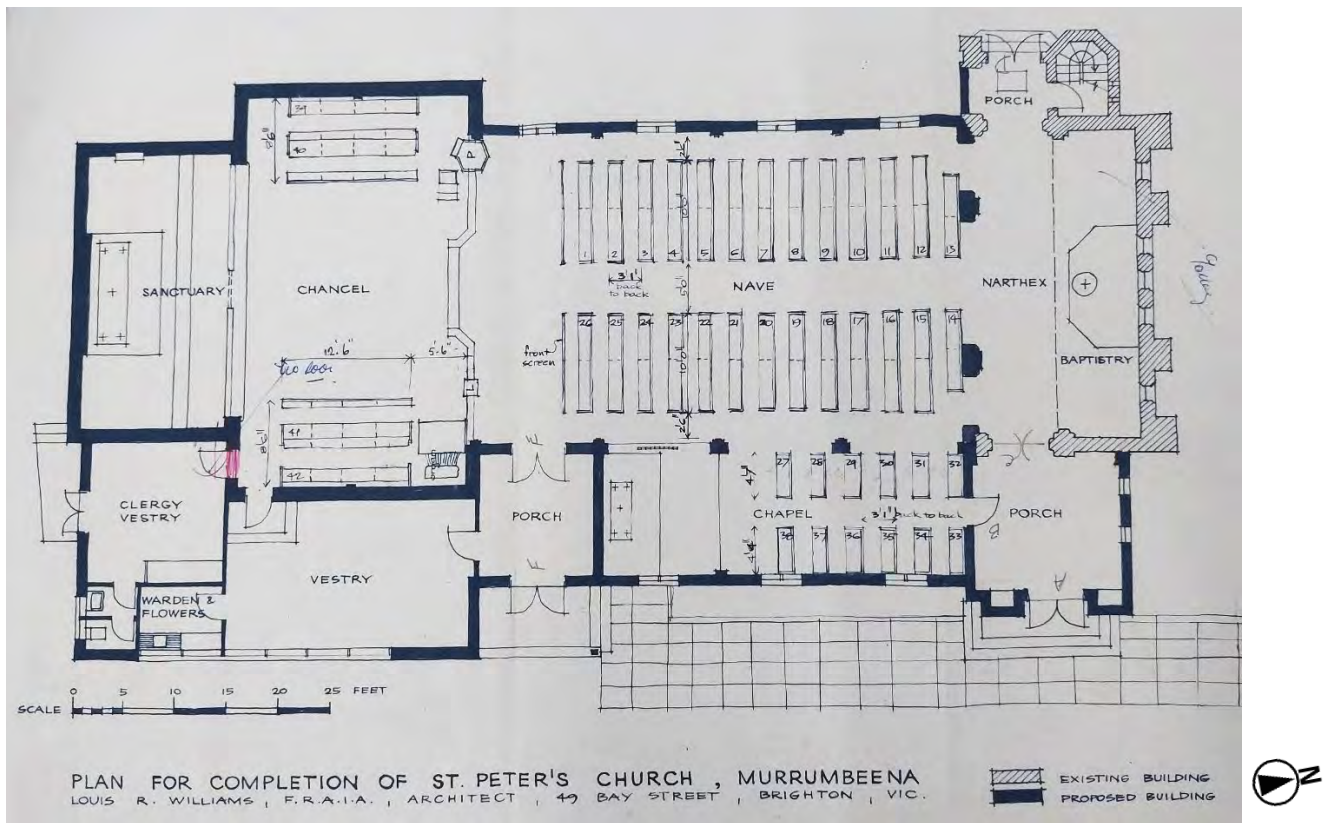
A c1958 floor plan, showing the existing building (walls hatched) and proposed building (walls coloured solid), by Louis R Williams (Source: PROV PB File)
